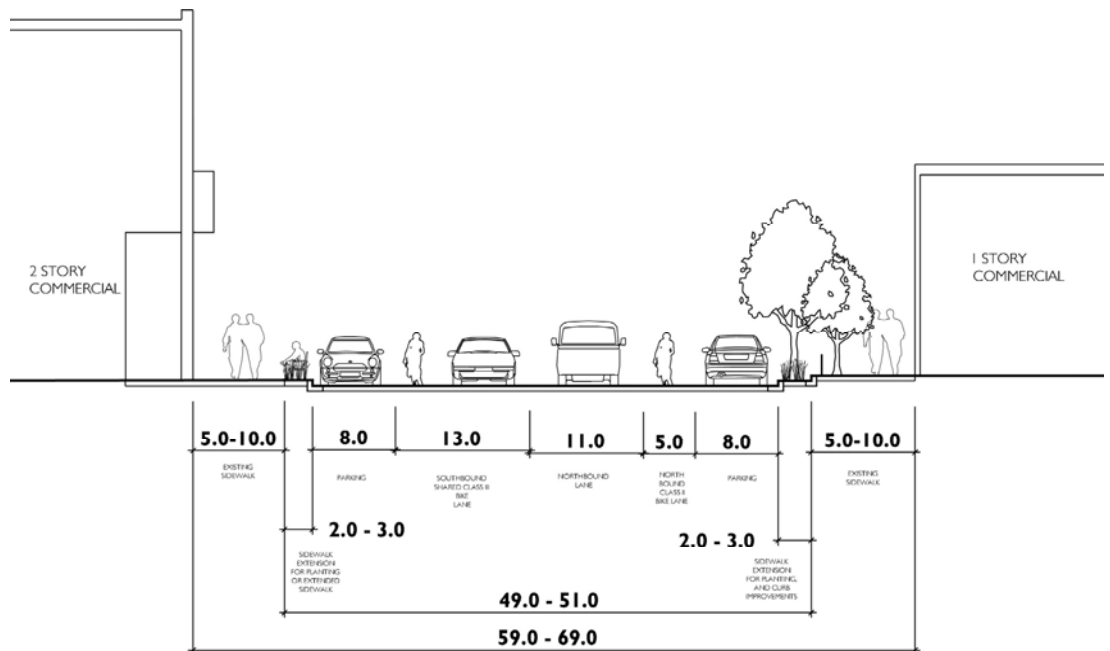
Proposed Main Street Cross Section (Looking North)
